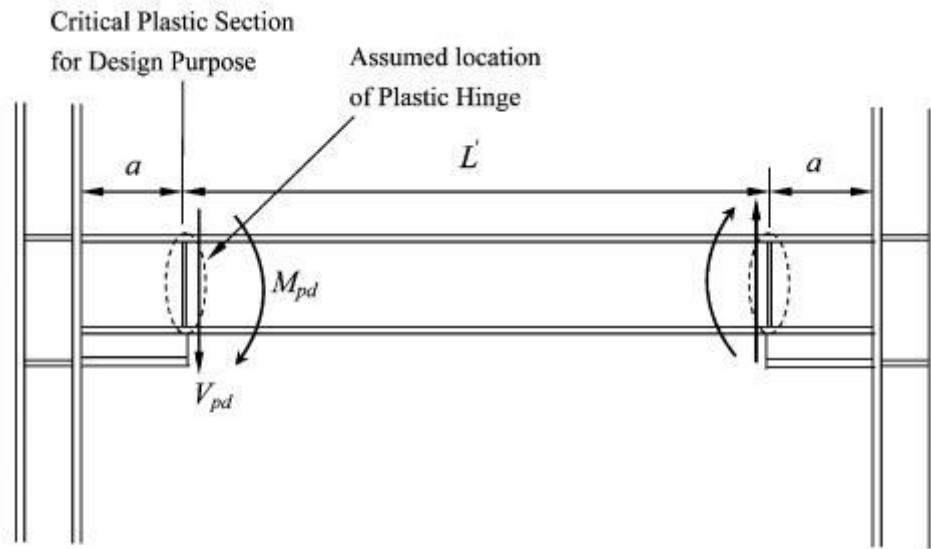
Typical Beam Span with Welded Straight Haunch
